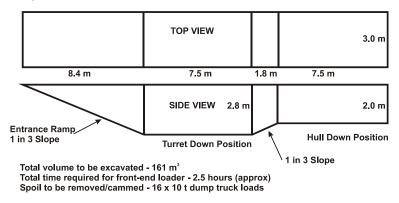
LAV Firing Position Stage 2—Hull-and Turret-Down Positions
